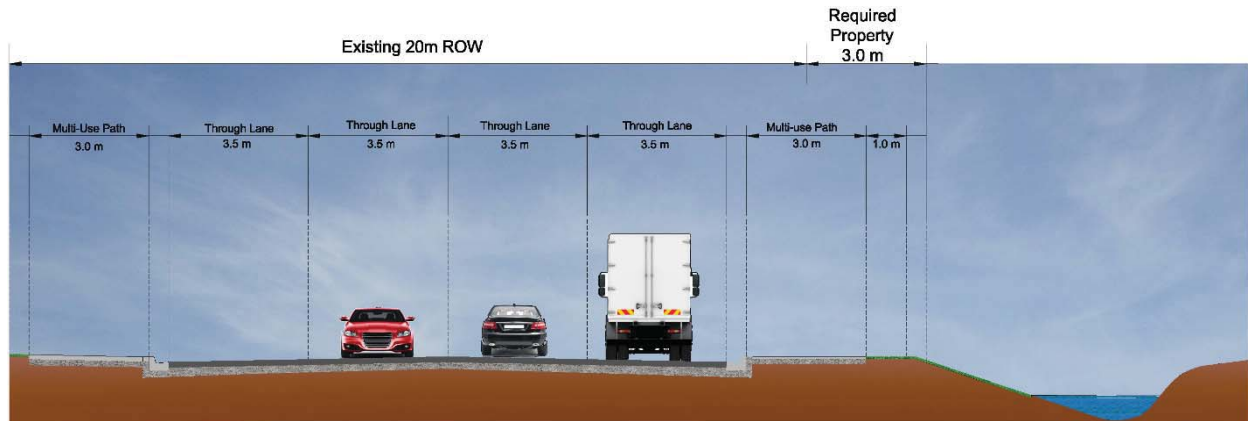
Typical Cross-Section for York Road Alternative 2.
